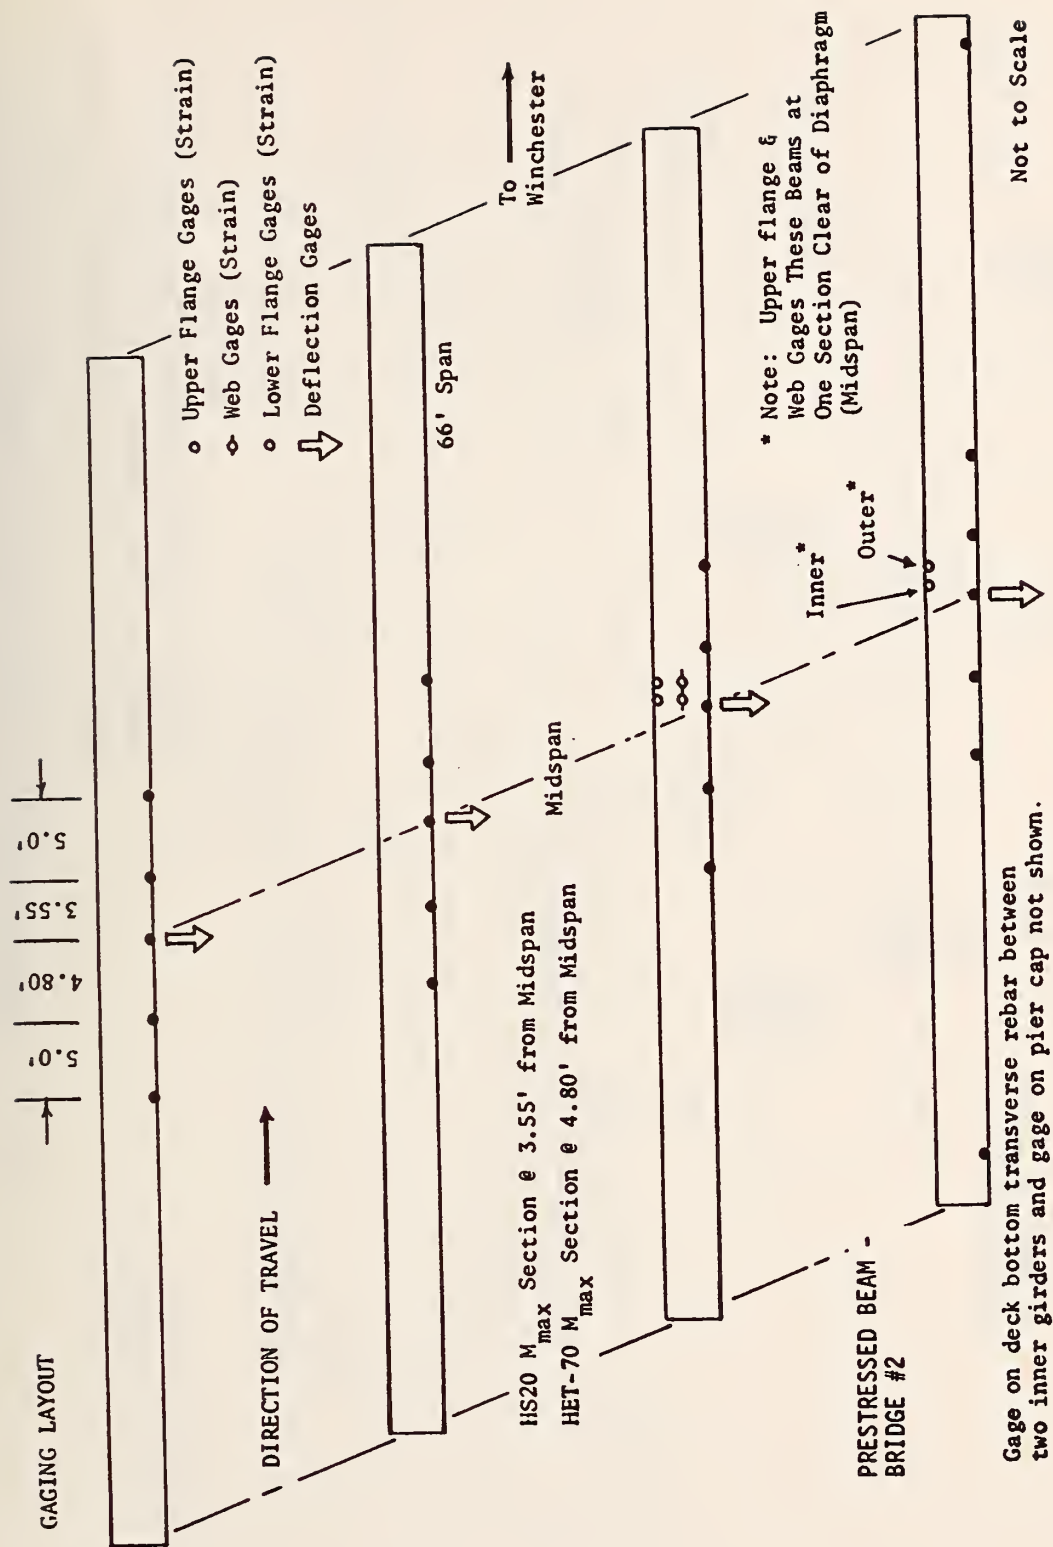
STRAIN GAGE AND DEFLECTION LOCATIONS FOR BRIDGE NO. 2
